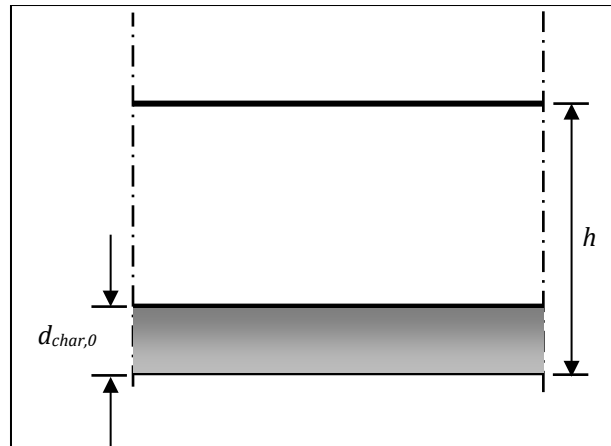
One-dimensional charring of wide cross-section with fire exposure on one side as per EC5
